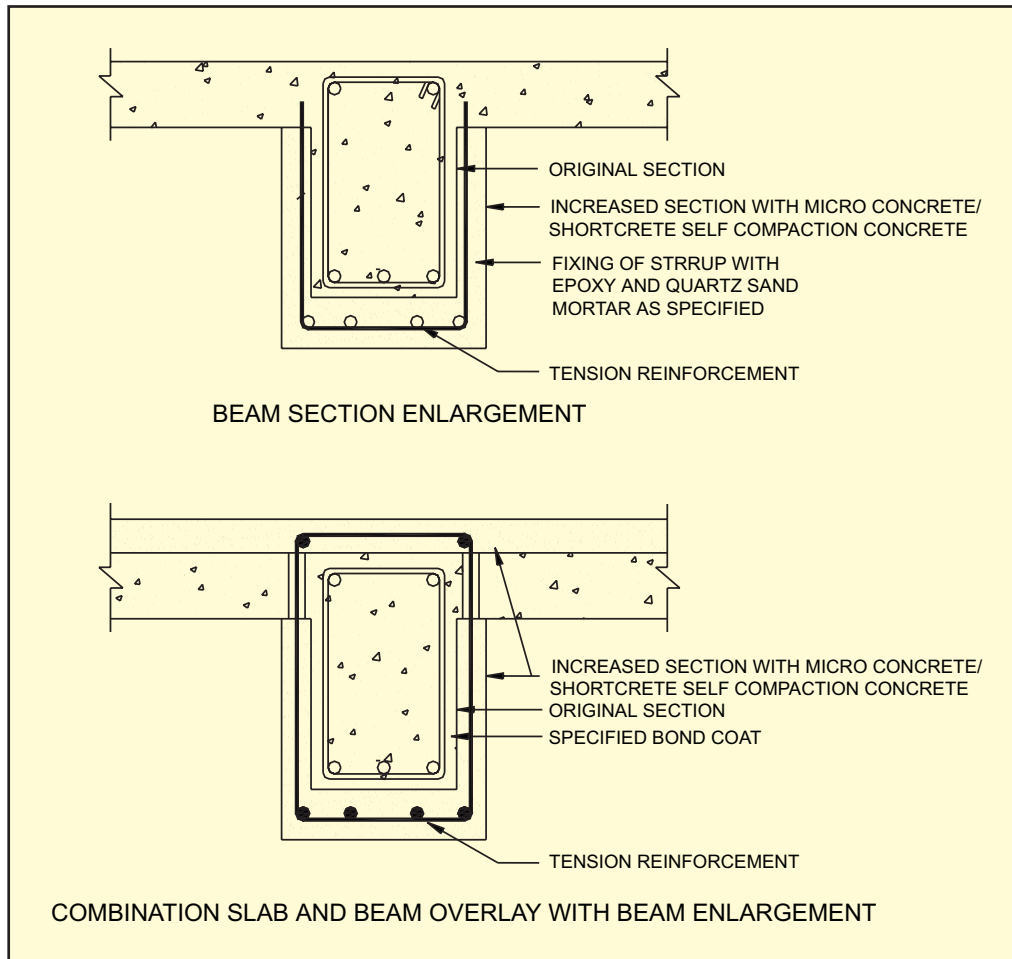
Beam Strengthening : Concrete Overlay And Section Enlargement
